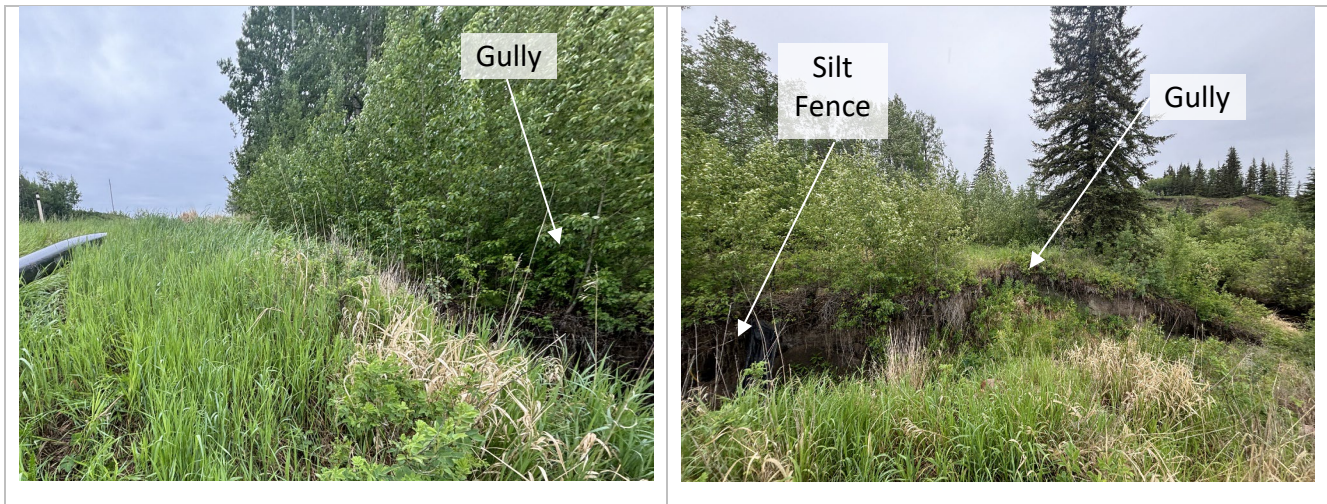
East side of Hwy 724:04 and bridge at GP039-II site. Photo taken June 11, 2024, facing north from south abutment of bridge.
